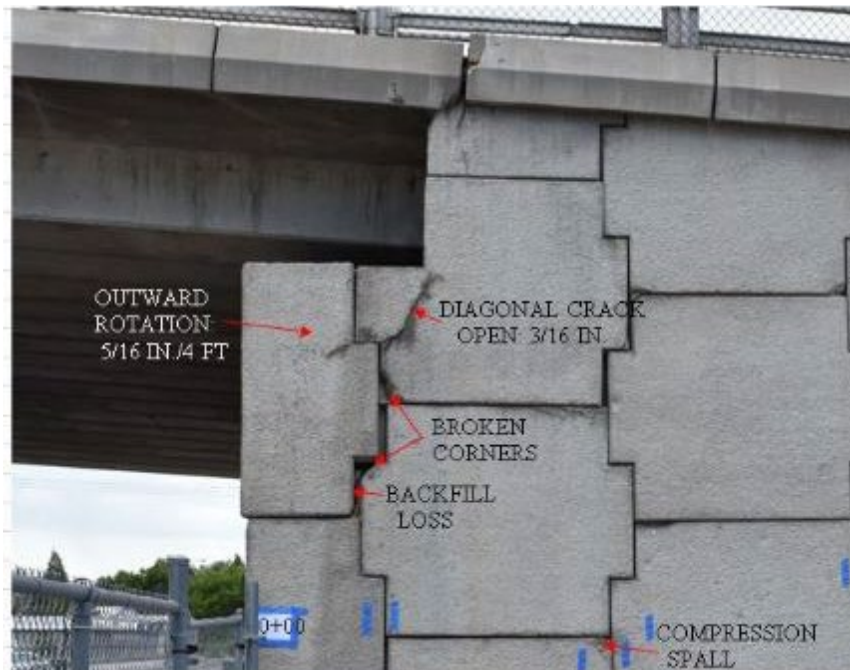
Photo of Gould Street Overpass, Wall 5, taken by sUAV
